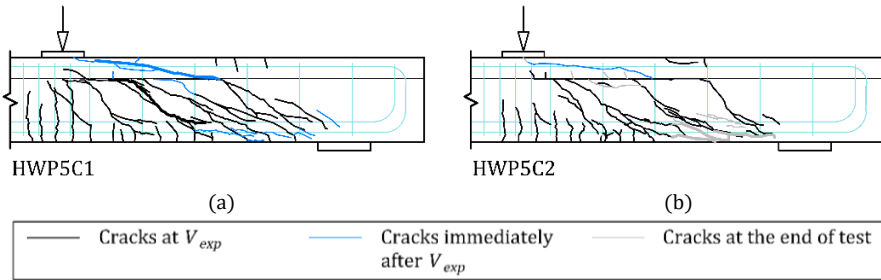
Examples of crack patterns in T-shaped beams with web reinforcement: (a) monolithic beam; (b) composite beam.
